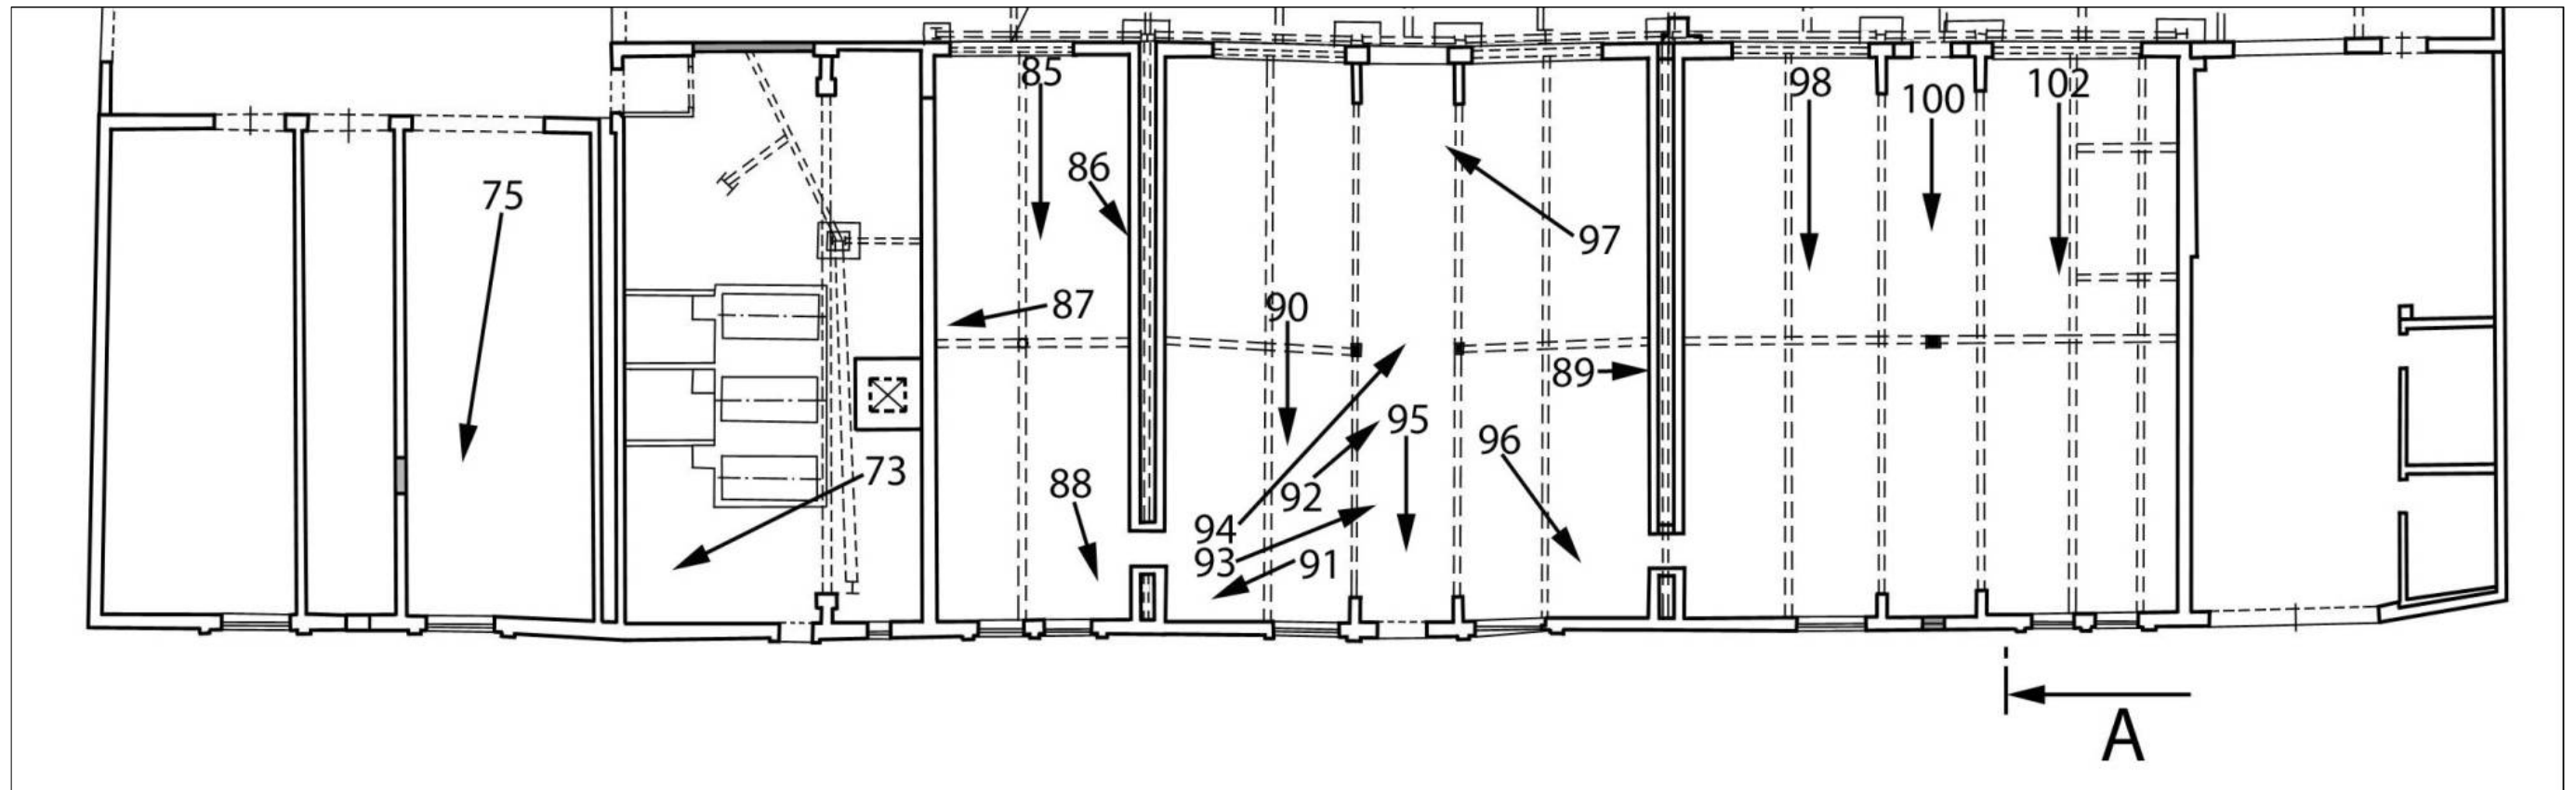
Photographic viewpoints in the first floor of designated areas 'GF3 & GF4'.
